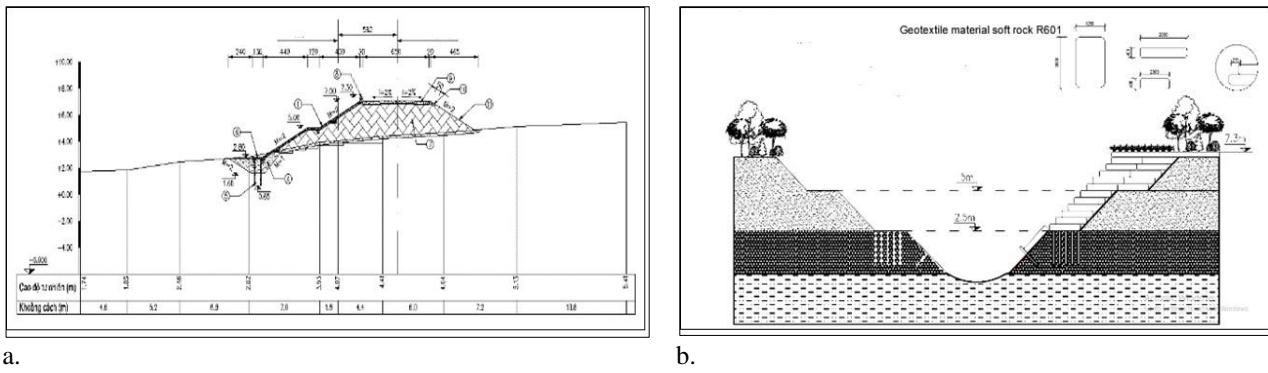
a) Hard-concrete embankment section, and b) Soft-concrete embankment section
